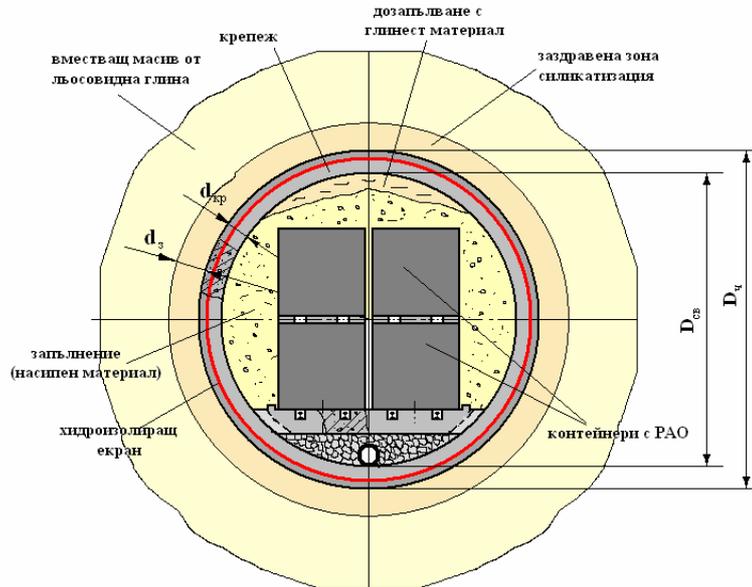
CROSS SECTION OF A TUNNEL TYPE REPOSITORY
